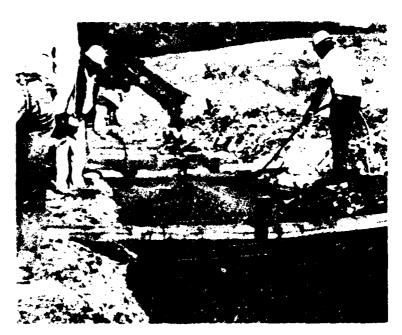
Spillway crest. Placing concrete in sill. 9 Apr 79
